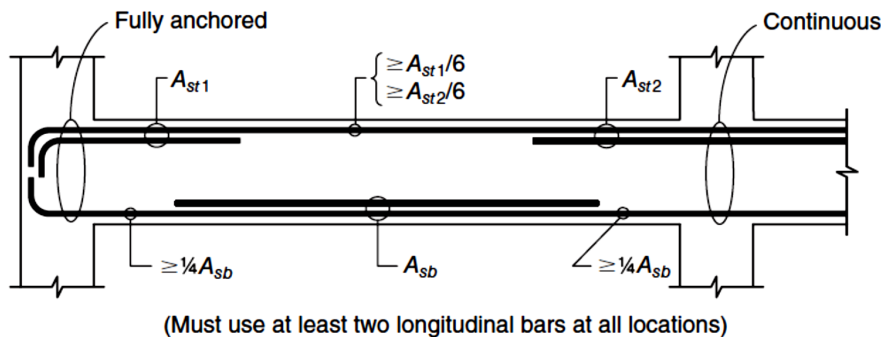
Requirements for longitudinal structural-integrity reinforcement in perimeter beams. (Note: required closed transverse reinforcement not shown.)
